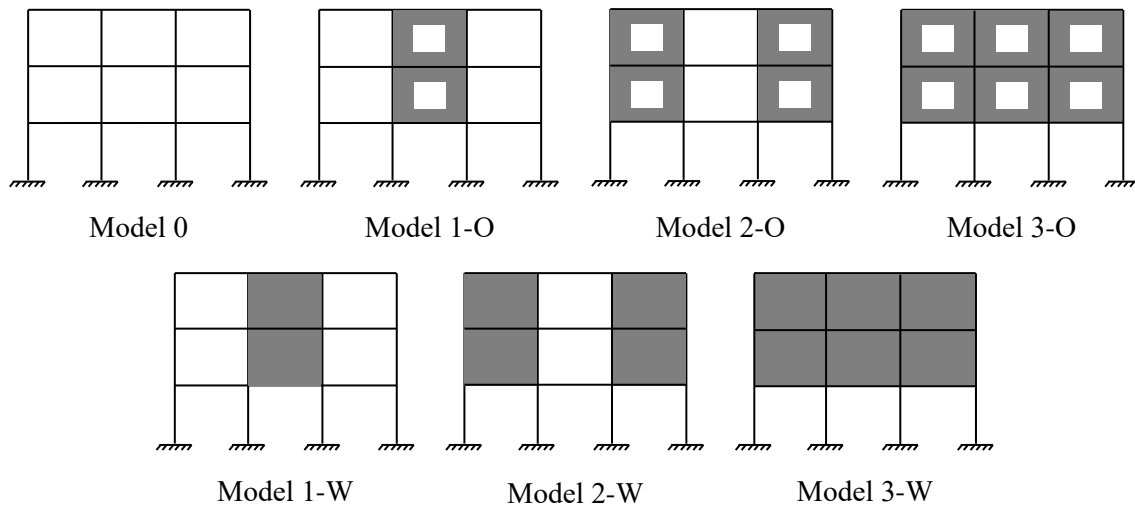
Naming different models of existing masonry infill walls in 3 story building and wall thickness of 17 (cm) (O: 1/3 opening, W: without opening) [6].
